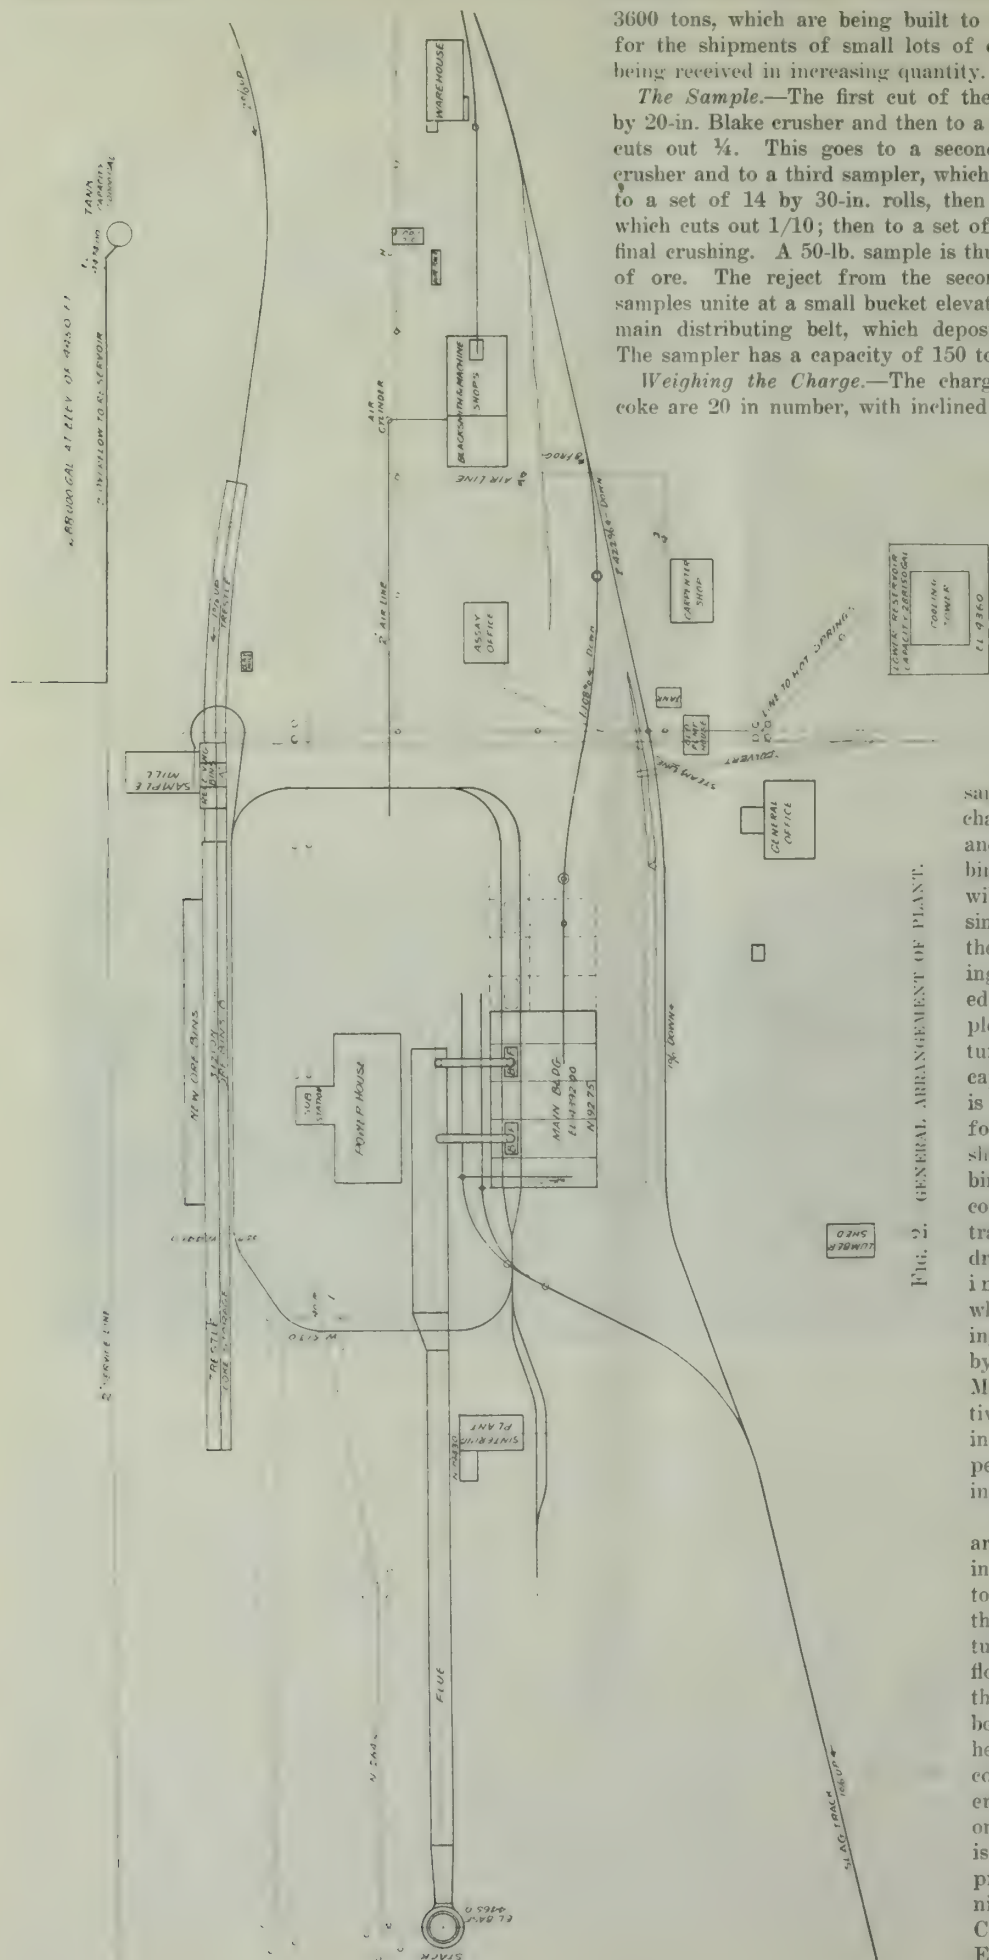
GENERAL ARRANGEMENT OF PLANT.
